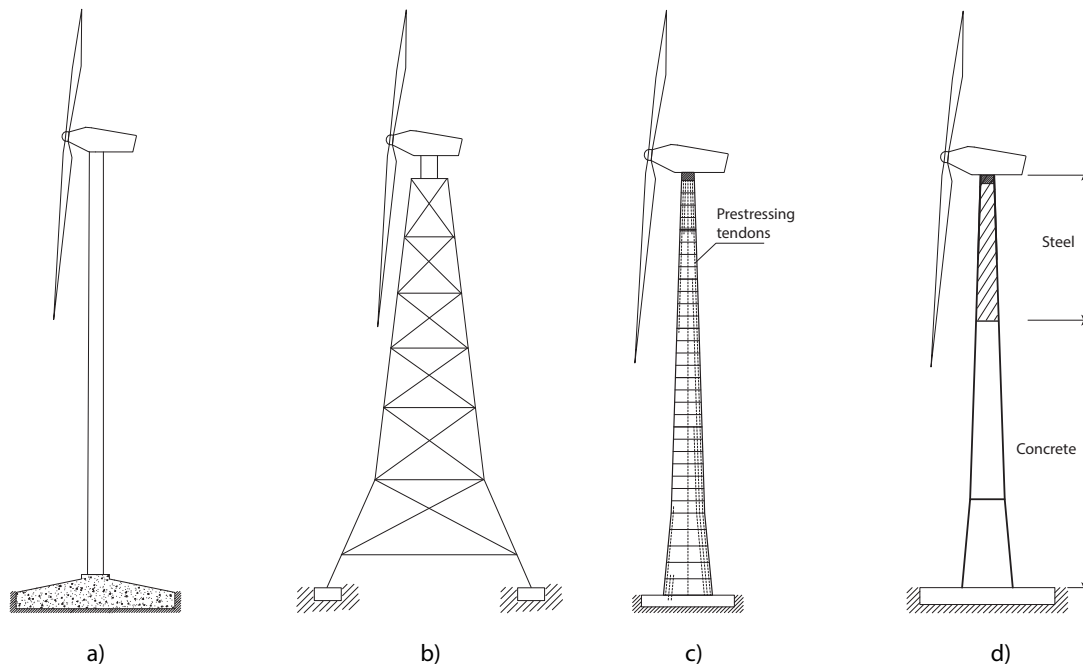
Various wind turbine tower types: a) steel tubular; b) lattice; c) concrete tubular; d) hybrid solution (adapted from (Tricklebank, Halberstadt et al., 2007))
